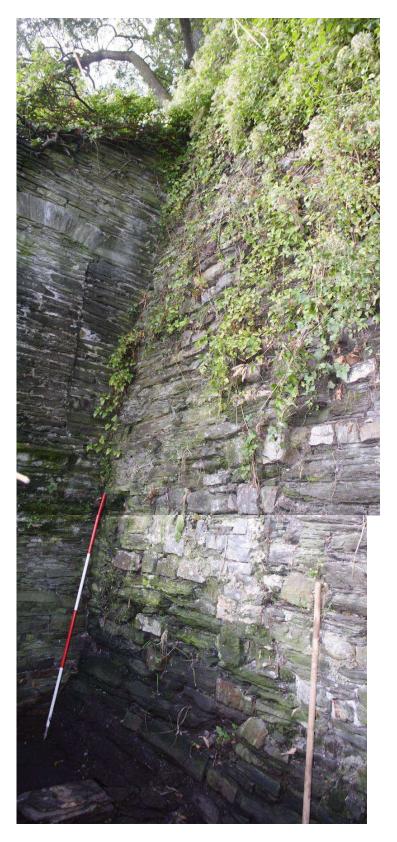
Composite photograph showing southeastern elevation of North East Bastion within southern half of Room 4 of Stables, 2m scale
